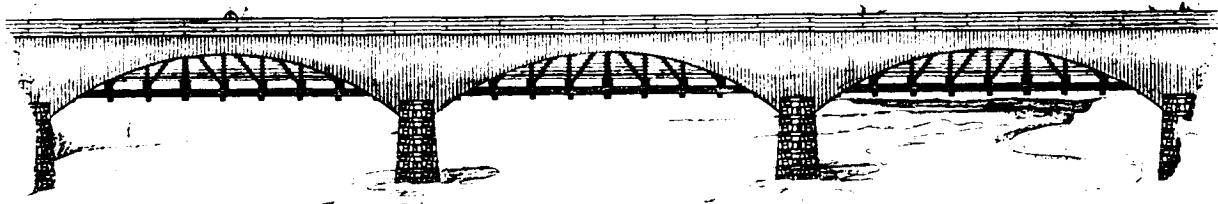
Elevation -Tohickon Burr Arch Aqueduct
